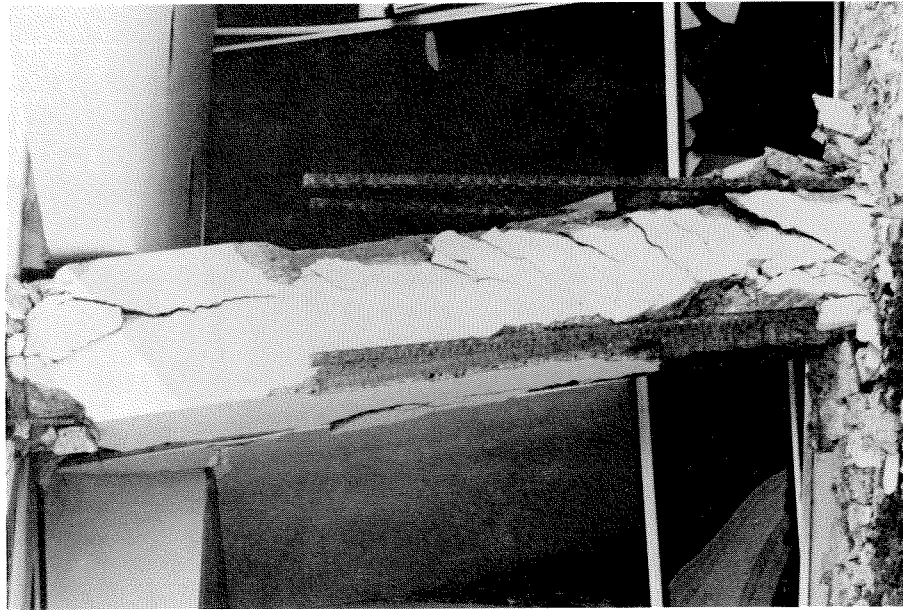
Spirally reinforced column at the Olive View Hospital. The untied reinforcing steel outside the core of columns spalled away on most of the columns of this type.
